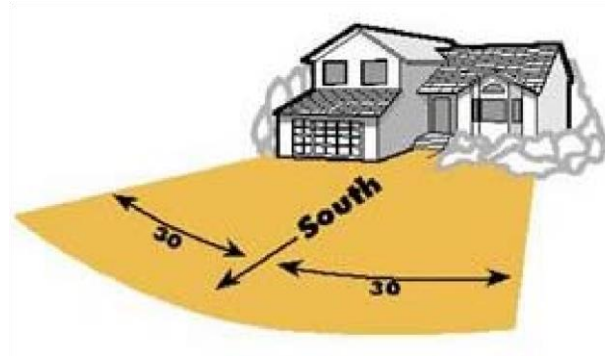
Design strategy: windows and doors should be orientated within 30degrees of true south
